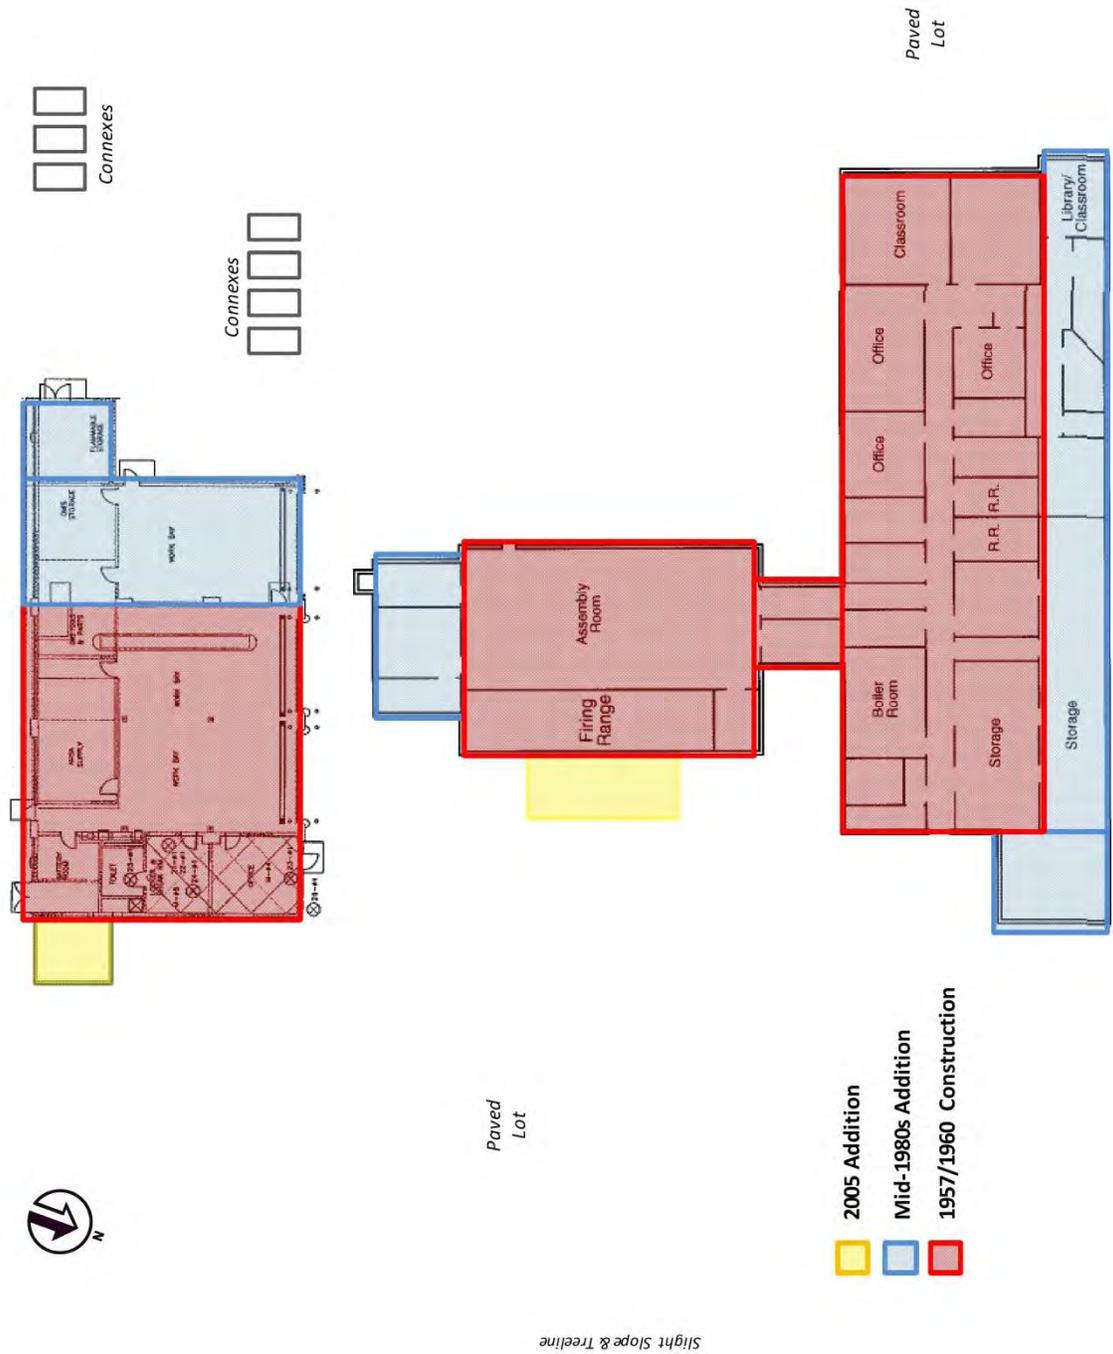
Courcelle USARC, current architectural floor plan of Main Building (altered from ECP [not to scale]).
